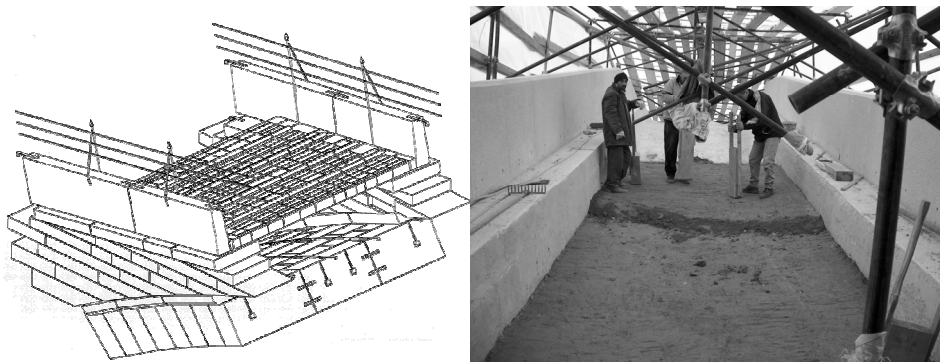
Cross section arch, spandrel walls and the cobblestone surface
